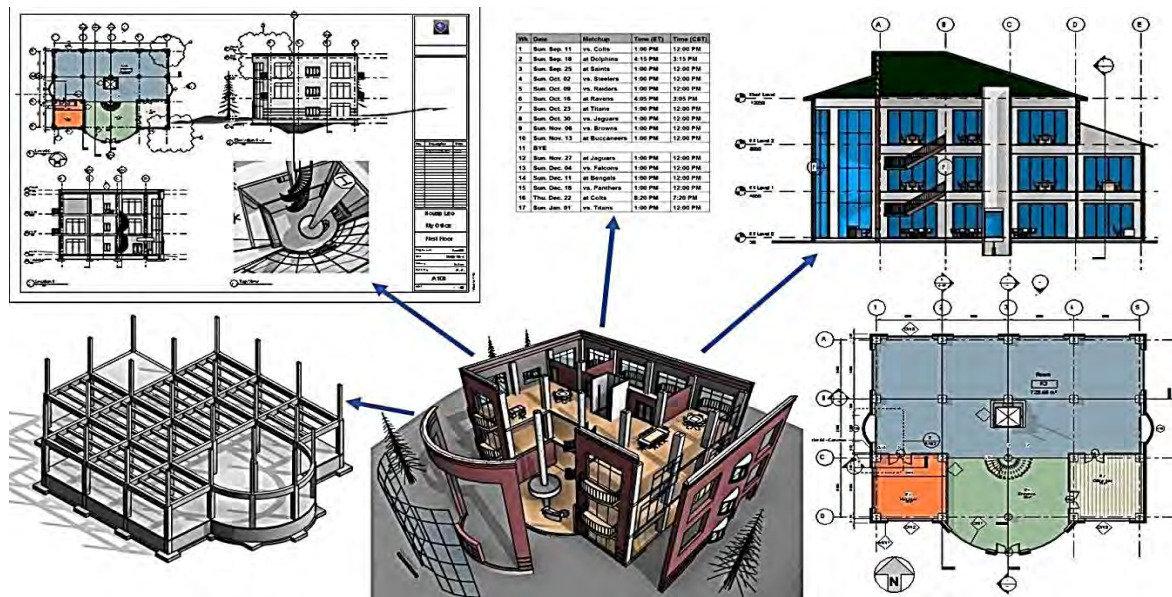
A BIM model shows some layers of an office building (“Autodesk Revit Training,” 2015) Source: Hussein and Zaid (2016).
